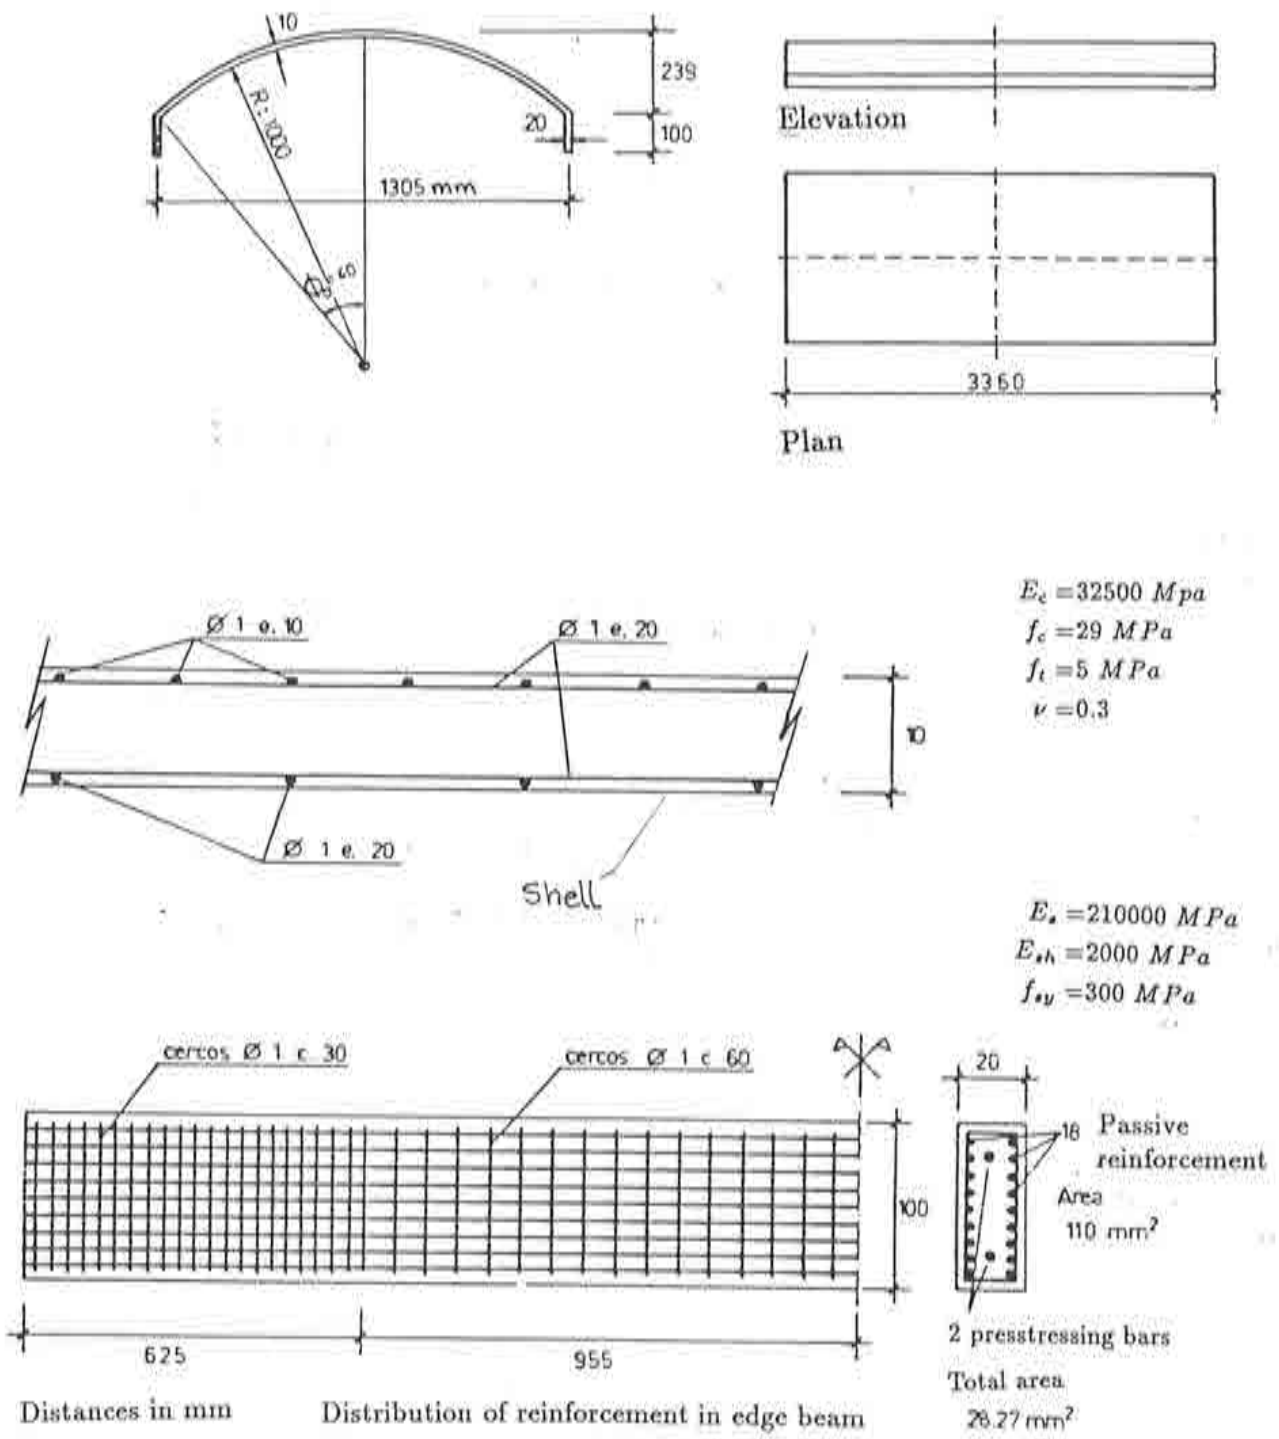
Cylindrical concrete shell. (a) Geometry. (b) Reinforcement steel in shell and edge beam.
